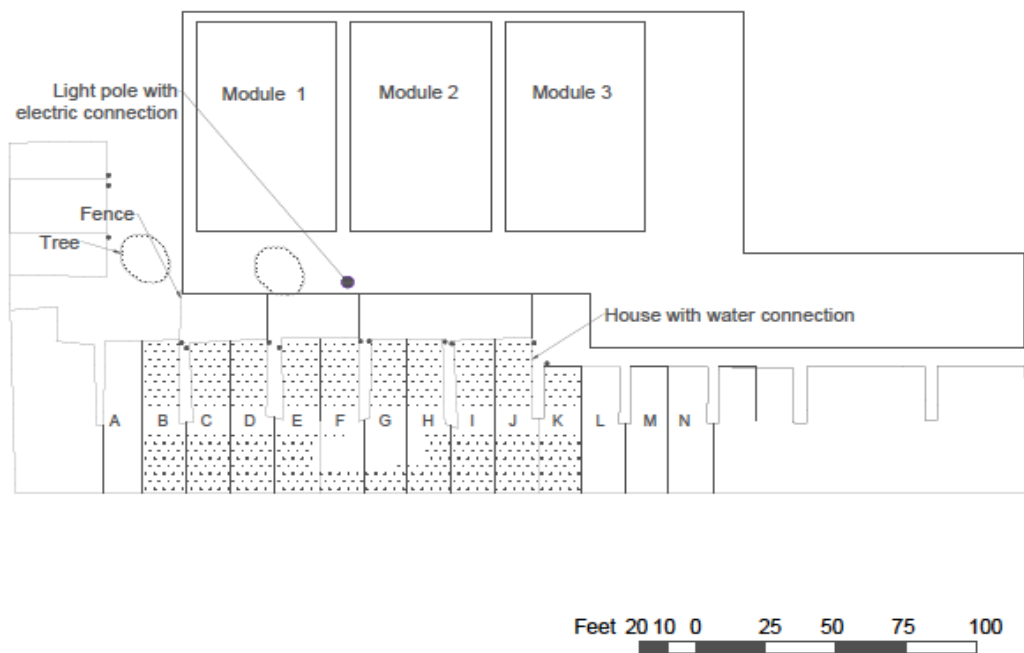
Site Layout at 53rd and Wyalusing Avenue
